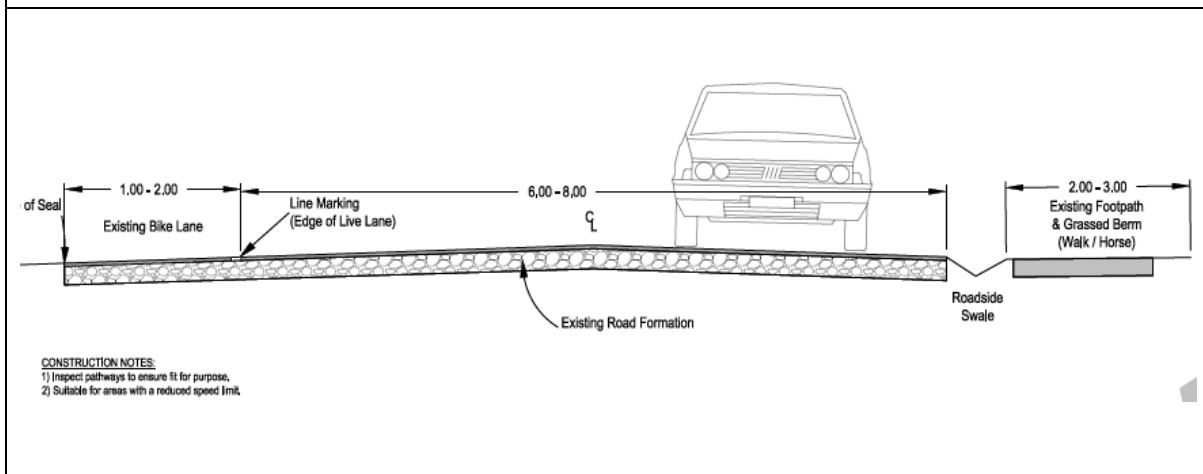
Typical Cross-section 9: Pathways adjacent highway in residential settlement
